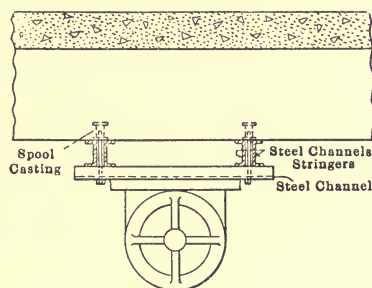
STRUCTURAL STEEL STRINGERS SUPPORTED FROM STEEL CASTING.
